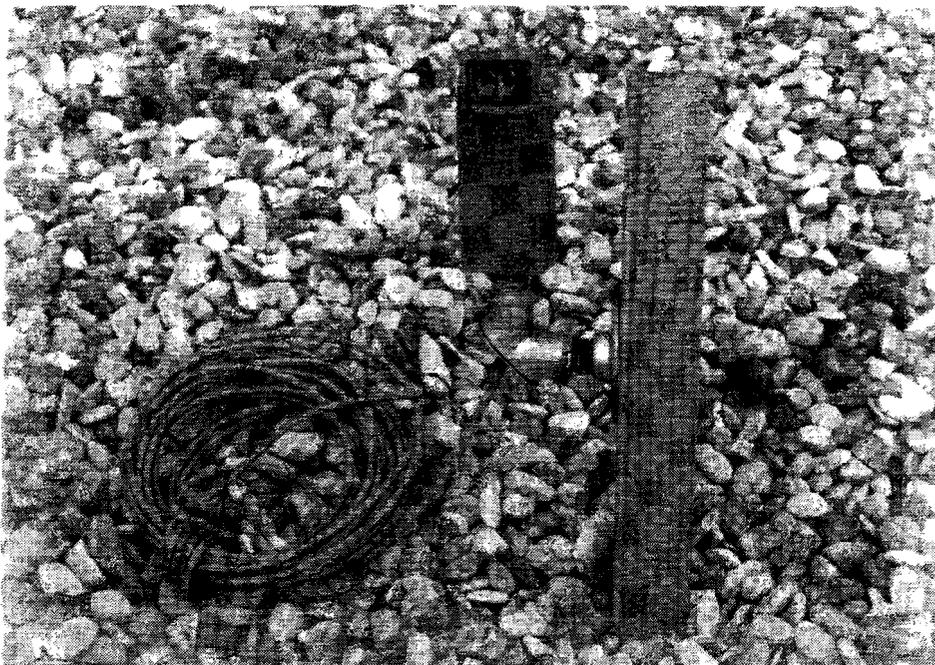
Opcon reflex infrared sensor mounted on metal post off edge of shoulder.
